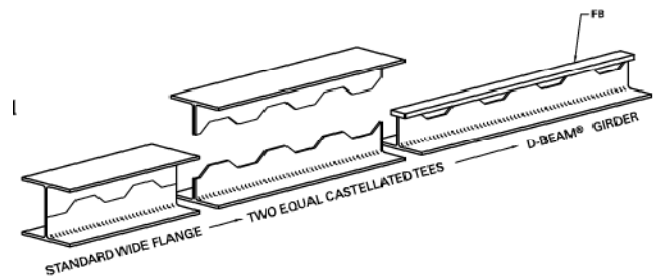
Two D-Beam Girders cut from a parent Wide-Flange
